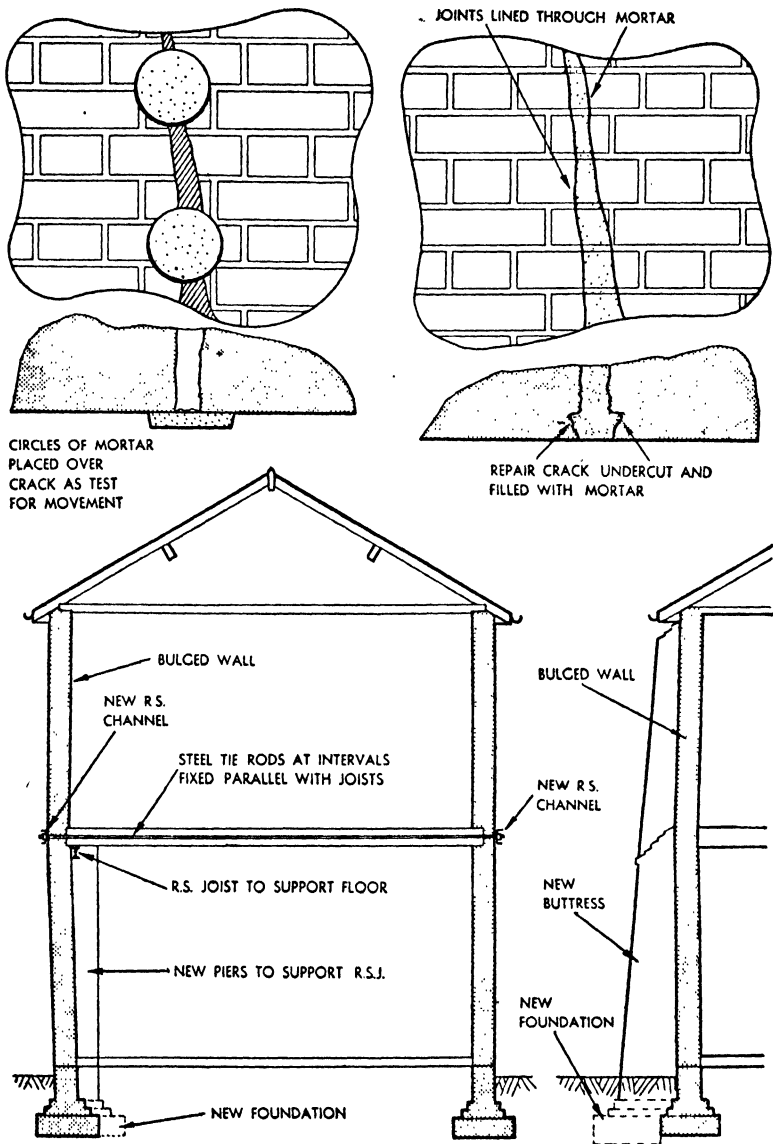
Extensive cracks and bulging in walls. Walls are strengthened with steel tie rods, with timber or steel plates running horizontally or vertically over the outside wall faces, or buttresses are built. Testing for movement is carried out by placing dabs of cement mortar at intervals over the cracks. If, after some time, the dabs are fractured, the continued opening of the crack is clearly indicated.
